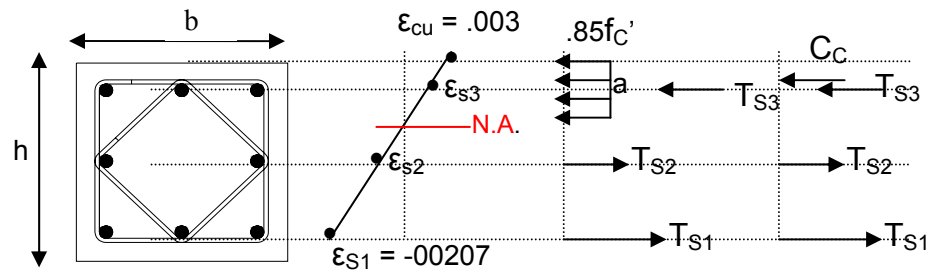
Cross section analysis used to compute the moment capacity of a reinforced concrete column.
